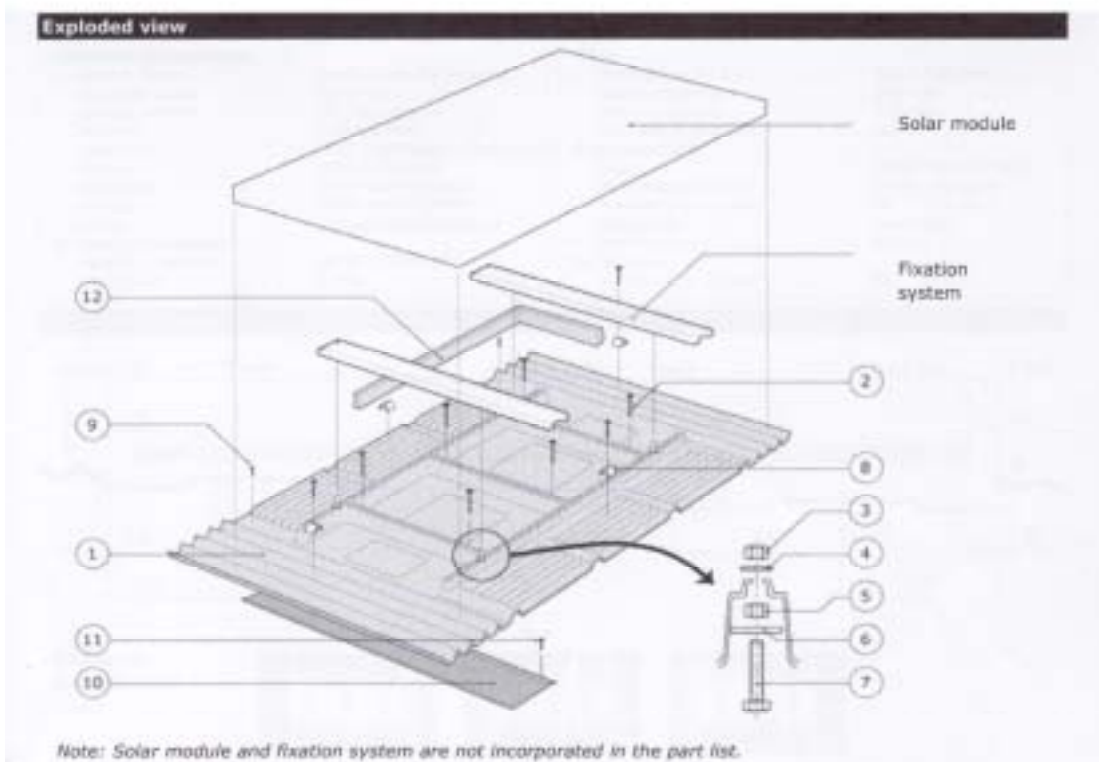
An exploded view of the Intersole system. Note the fixing bolt detail (Manufacturer data).
